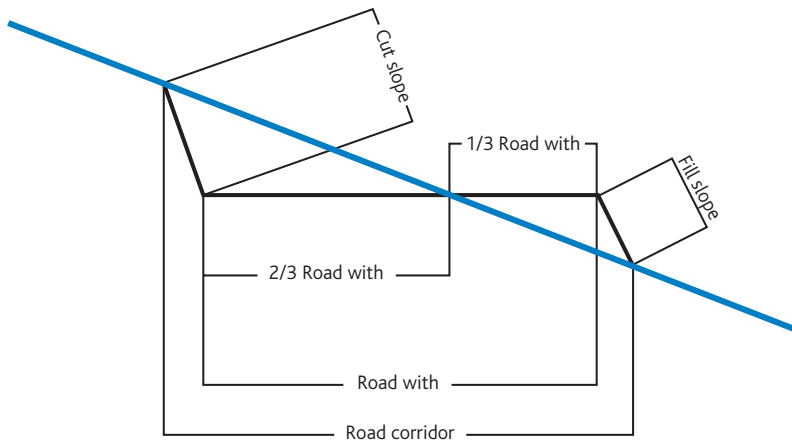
Typical Cross section for construction with bulldozer/angle dozer [PERTLIK]
